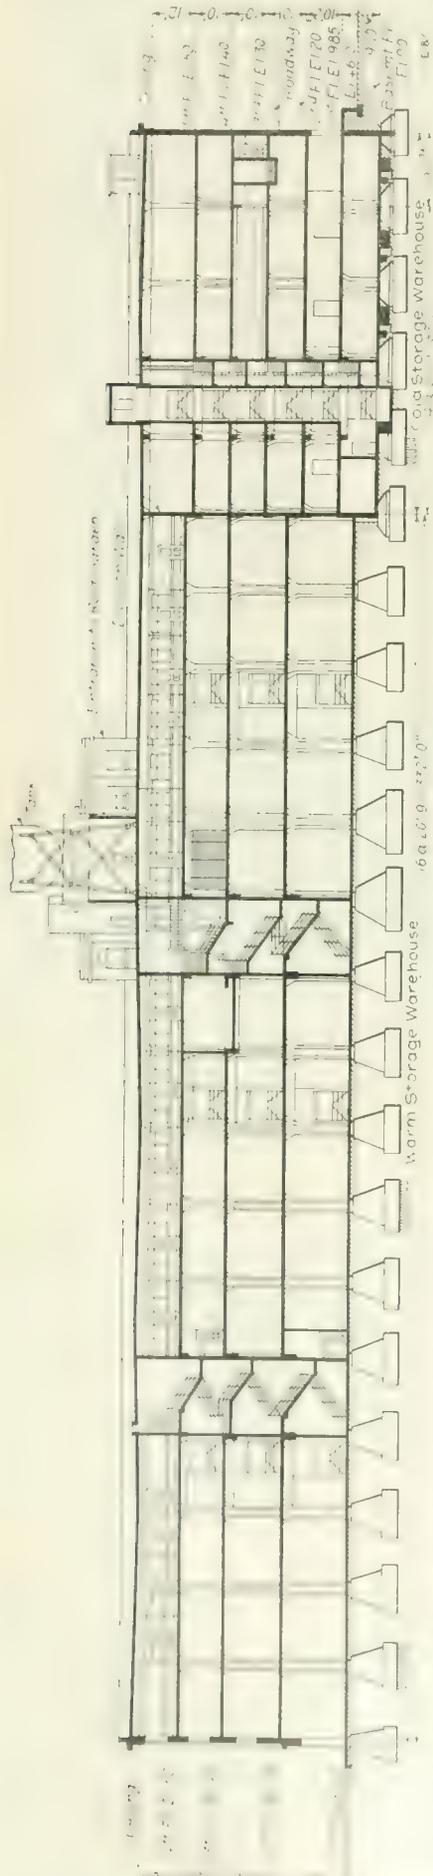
Longitudinal Section of Warehouse Showing Story Heights of Warm and Cold Storage Sections and General Features.
